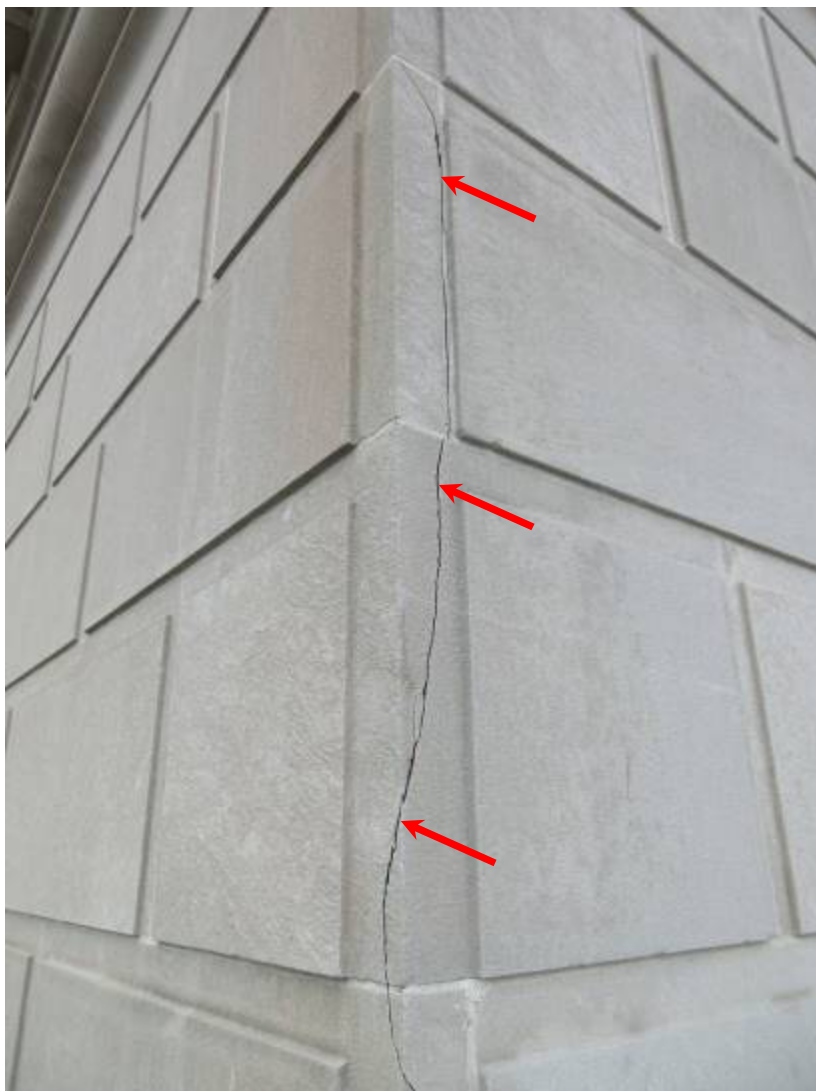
Cracked stones at the eighth floor at the northeast corner.
